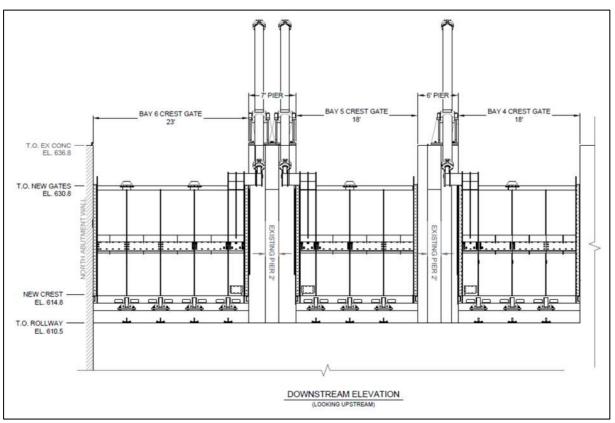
Cross Section View of Edenville Dam 3-Bay Crest Gate Spillway
